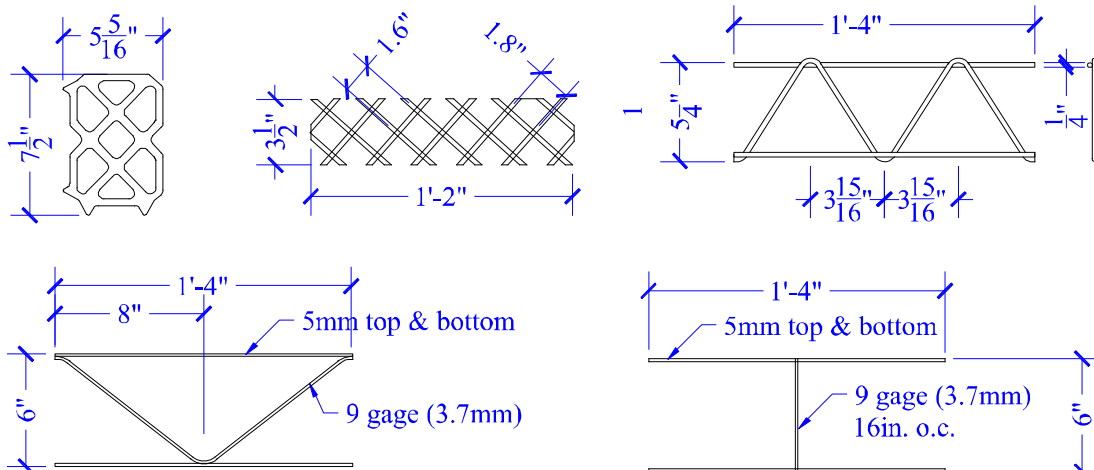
Examples of shear connectors used for concrete sandwich walls with partial degree of composite action; 1" = 25.4 mm (Naito et al., 2012).
